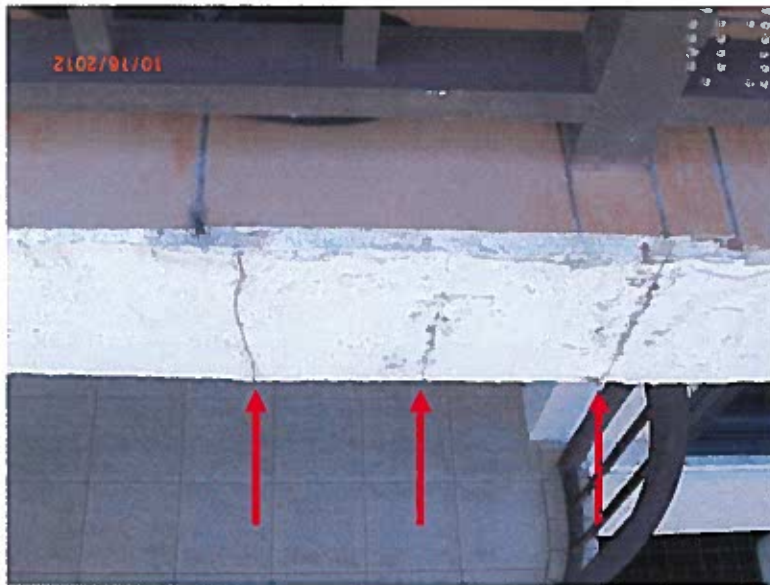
Cracking/delaminated stucco on balcony slab edge at Unit #407
